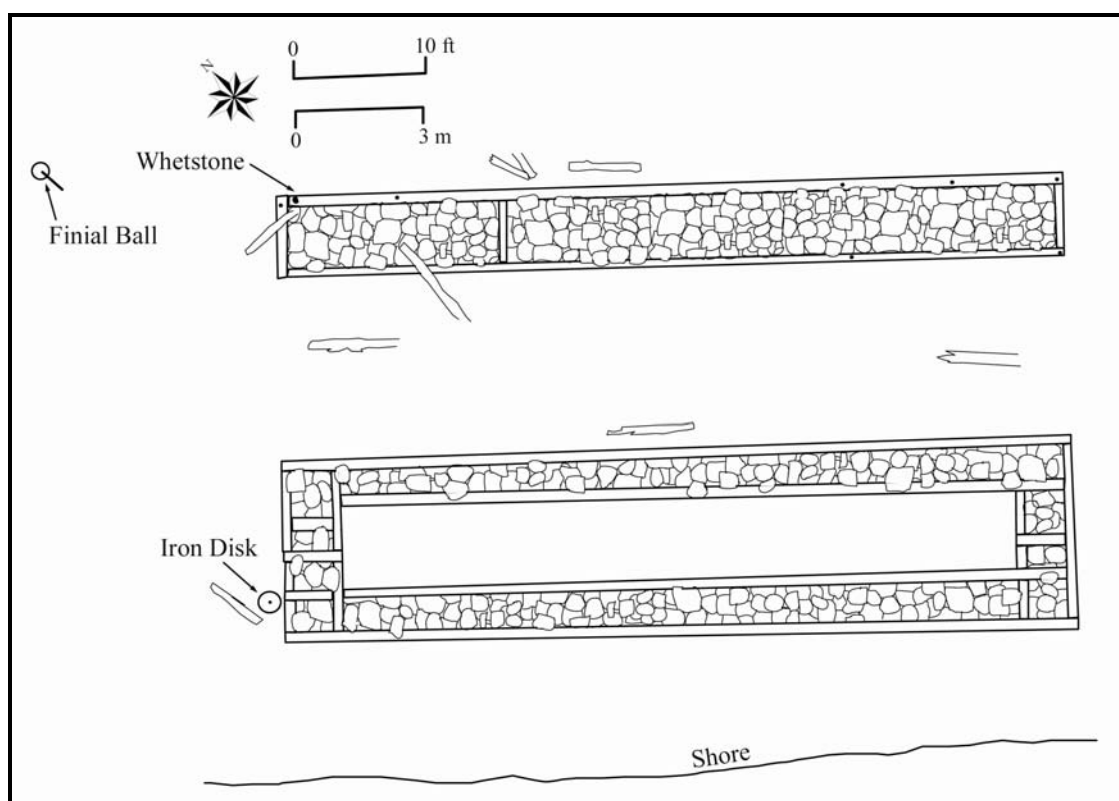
Schick boathouse foundation, Carleton Island.
